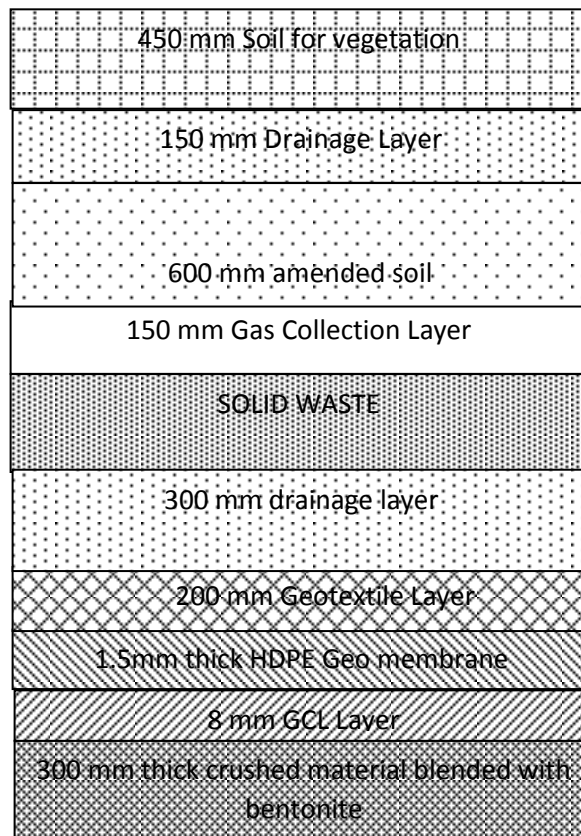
Sections of Top Cover and Bottom Liner System of landfill
